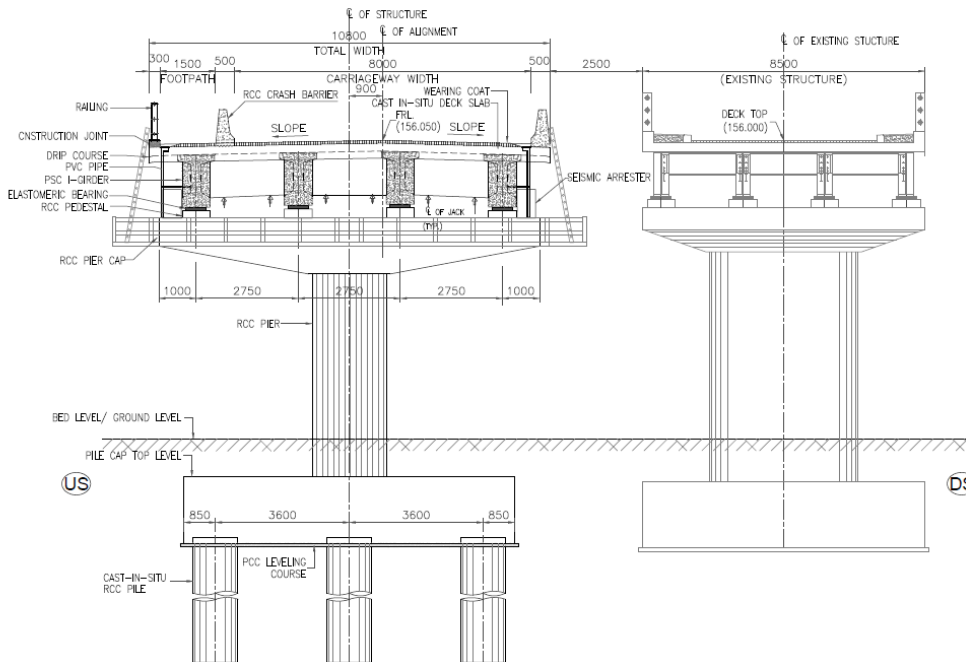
Cross-Sections of Houay Deua2 Bridge
